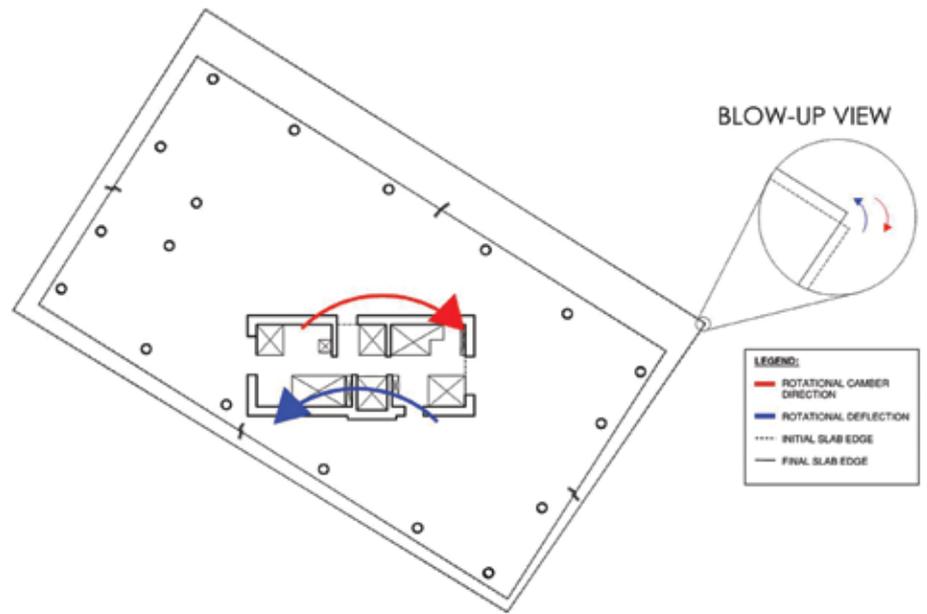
Rotational Camber (Source: DeSimone Consulting Engineers, PLLC)
